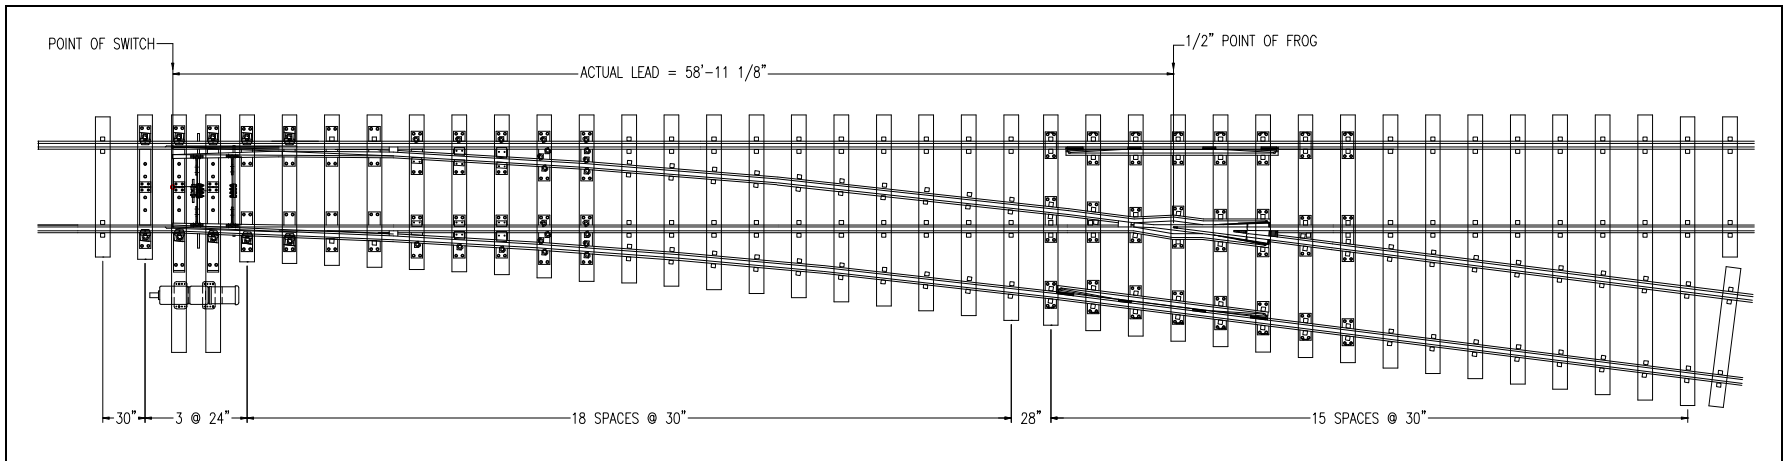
Optimized No. 8 transit concrete turnout spacing and layout
